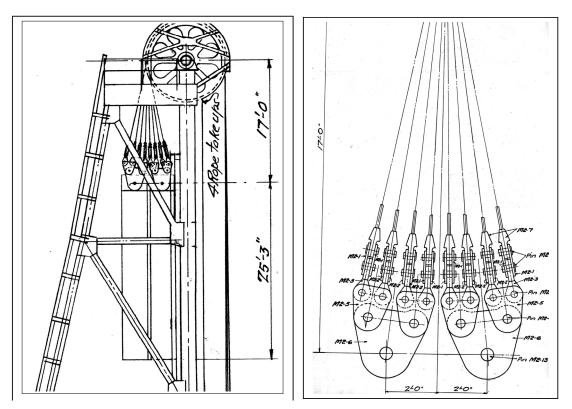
Hoisting Sheave and Counterweigh (left) and Equalizer Detail (right) (NHDOT)
